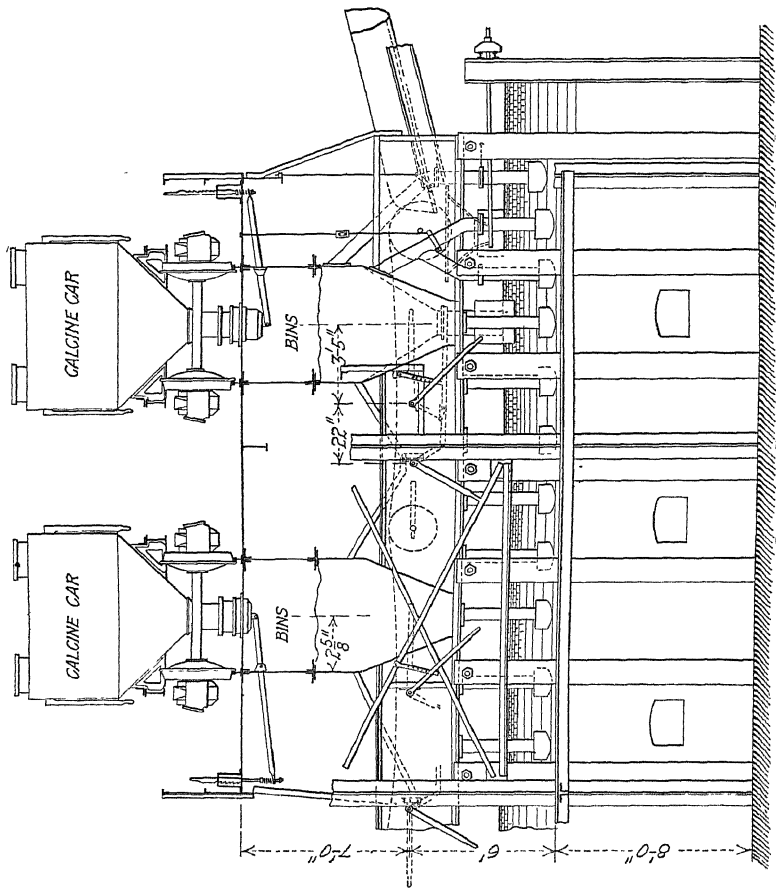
SIDE ELEVATION OF REVERBERATORY FURNACE SHOWING CHARGING ARRANGEMENT.
